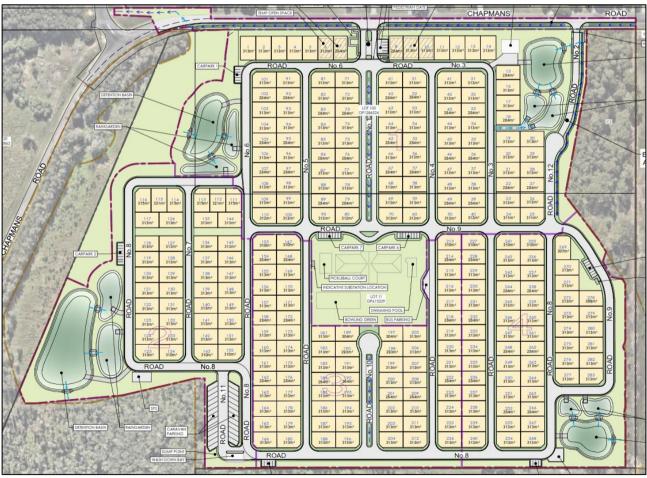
Proposed development (Master Plan – ADWJ – 190835-MP- revision K dated 09/12/2024)
